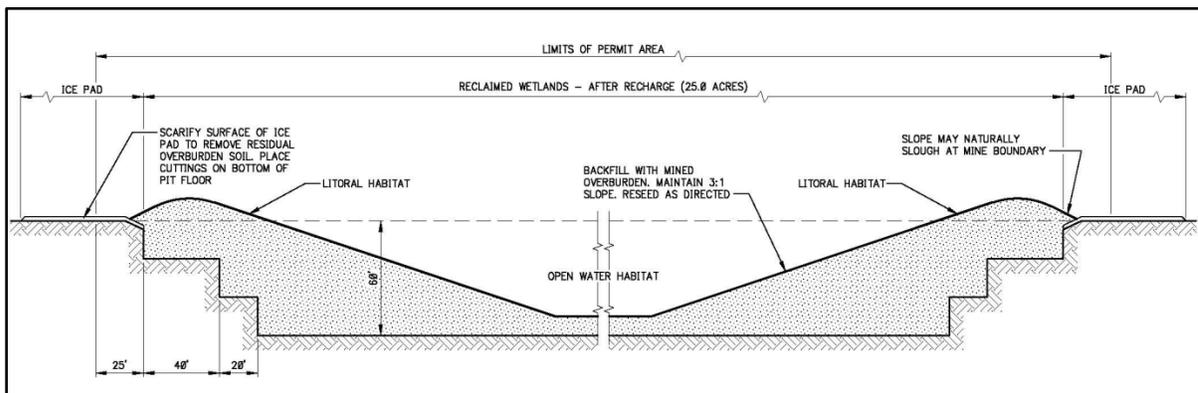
Proposed Mine Site Reclamation Section View
